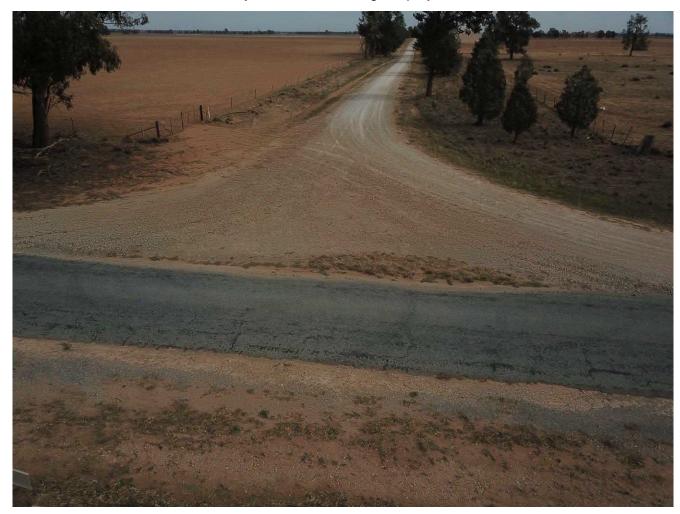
Intersection at Sandigo road (sealed) and Muntz Road (unsealed) looking west
